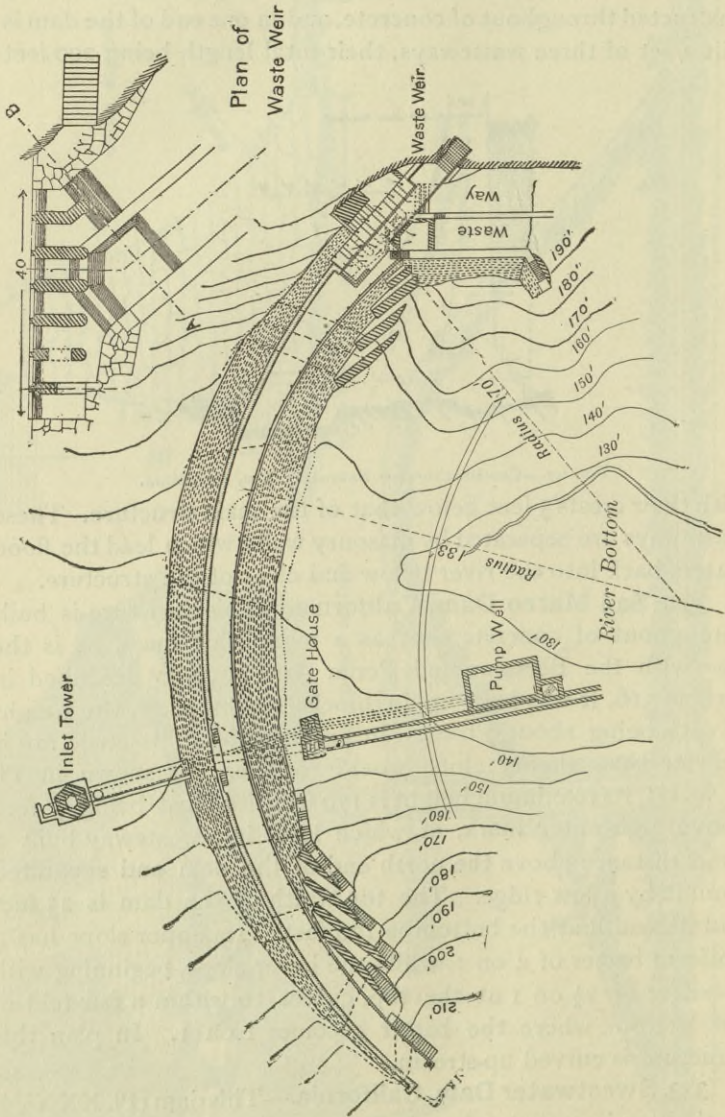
PLATE XXXIV.—PLAN OF SWEETWATER DAM.
